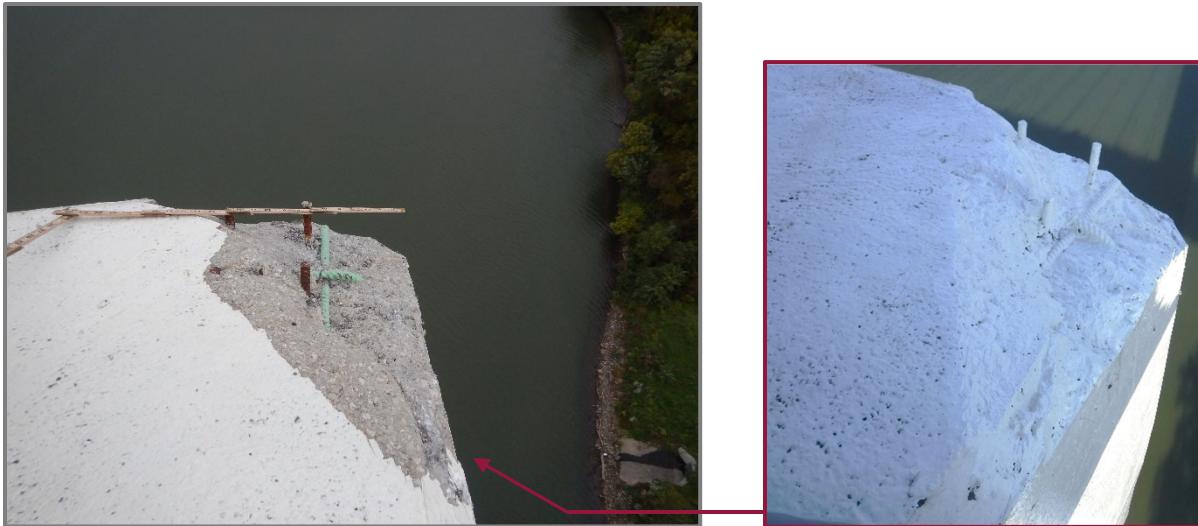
Tower 4 northwest corner with existing spall (looking west) and after area was sealed (looking southwest).
